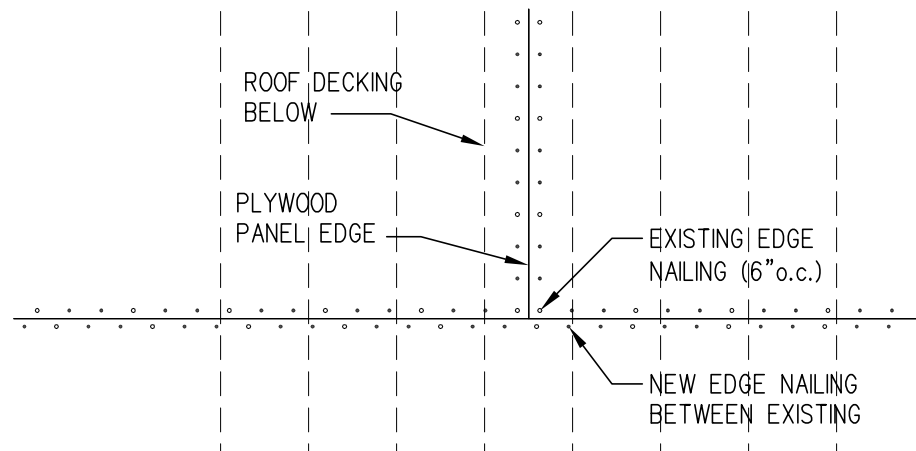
G: PLAN OF PLYWOOD PANEL EDGE NAILING
